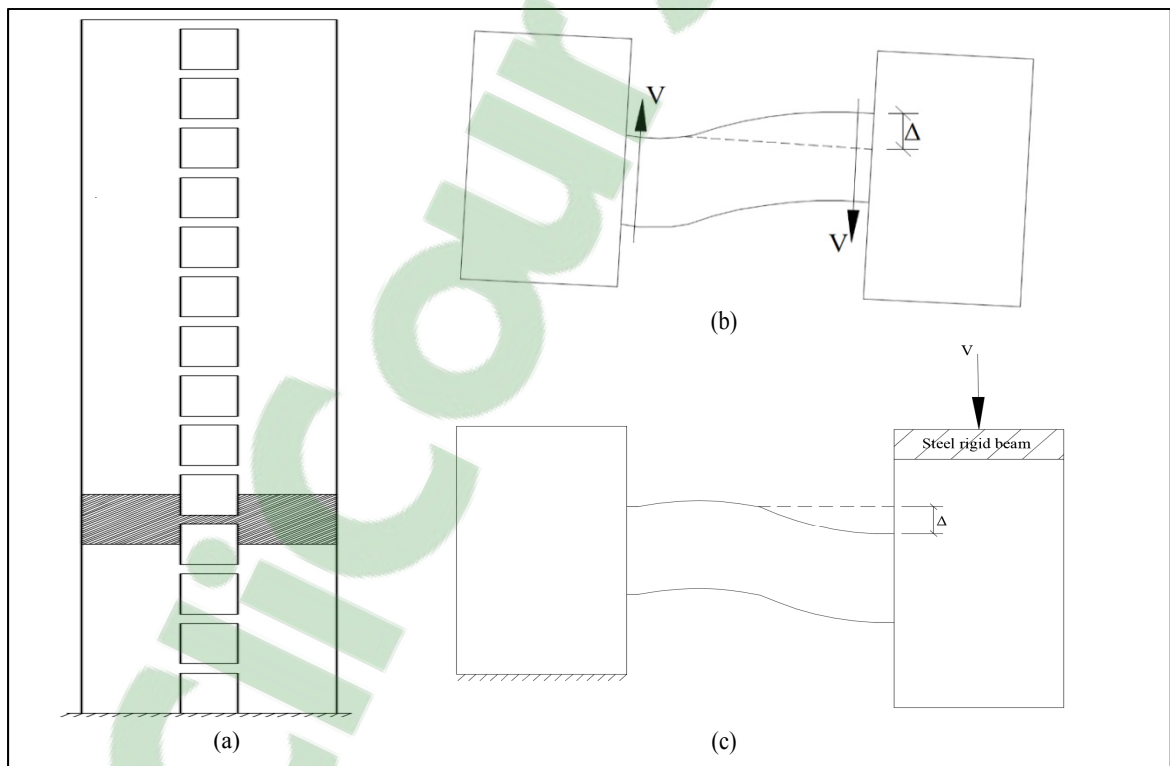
Coupled wall system and behavior: (a) coupled wall system, (b) wall section in actual structure, (c) simulation of CSW in experimental test
